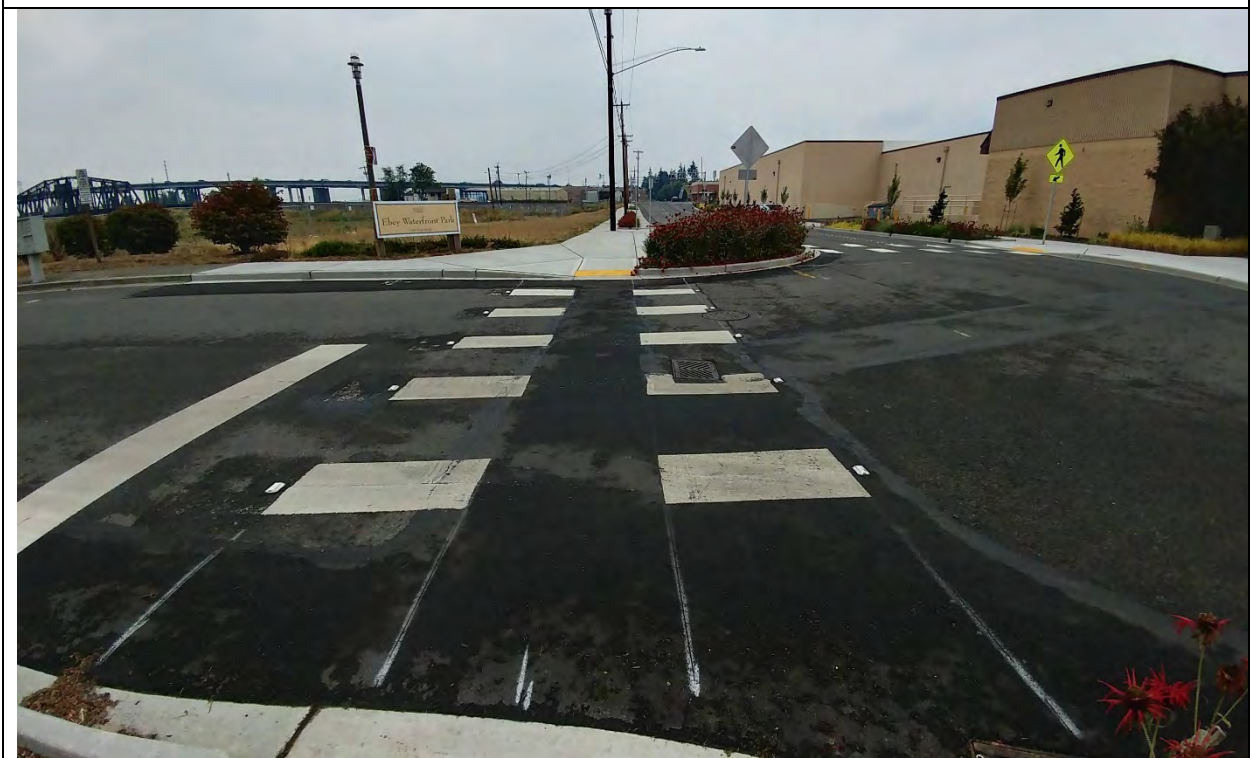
Entrance to Ebey Waterfront Park via 1st Street looking west (7/11/2018).
